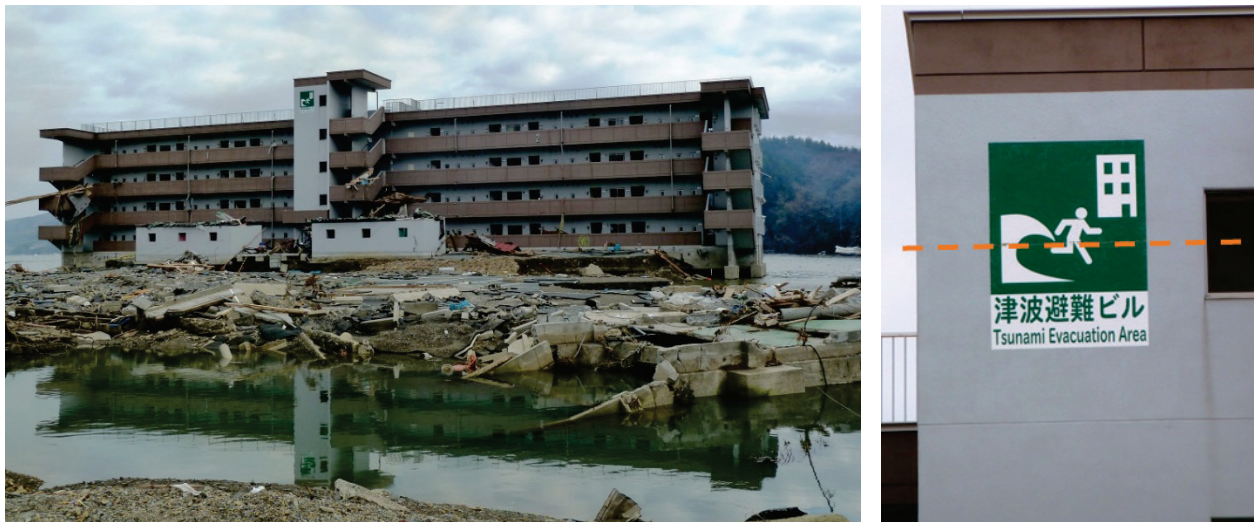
Designated tsunami evacuation building in Minamisanriku, Japan, and trace of tsunami inundation level on evacuation signage, 2011 Tohoku tsunami (photos courtesy of I. Robertson and ASCE, from Chock, et al., 2013b)
